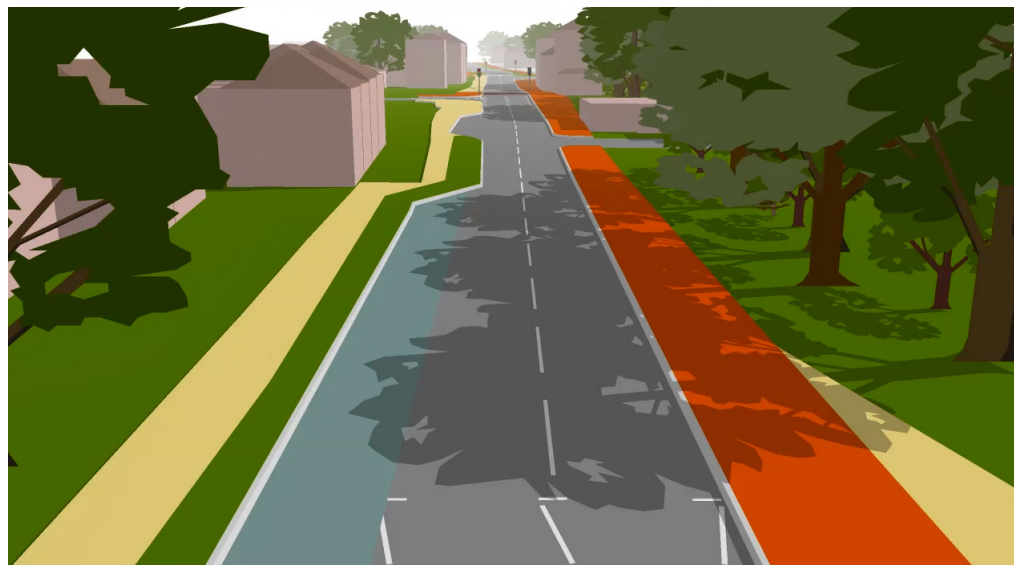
3D Views of Cycle Infrastructure Proposal: Typical layout, Central Corridor
